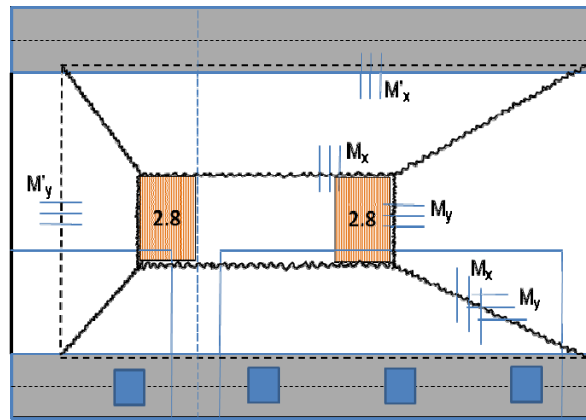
Load Case 2.4; Credible Failure Modes for Precast Interior with Trailing Wheel Load on Single Panel.
